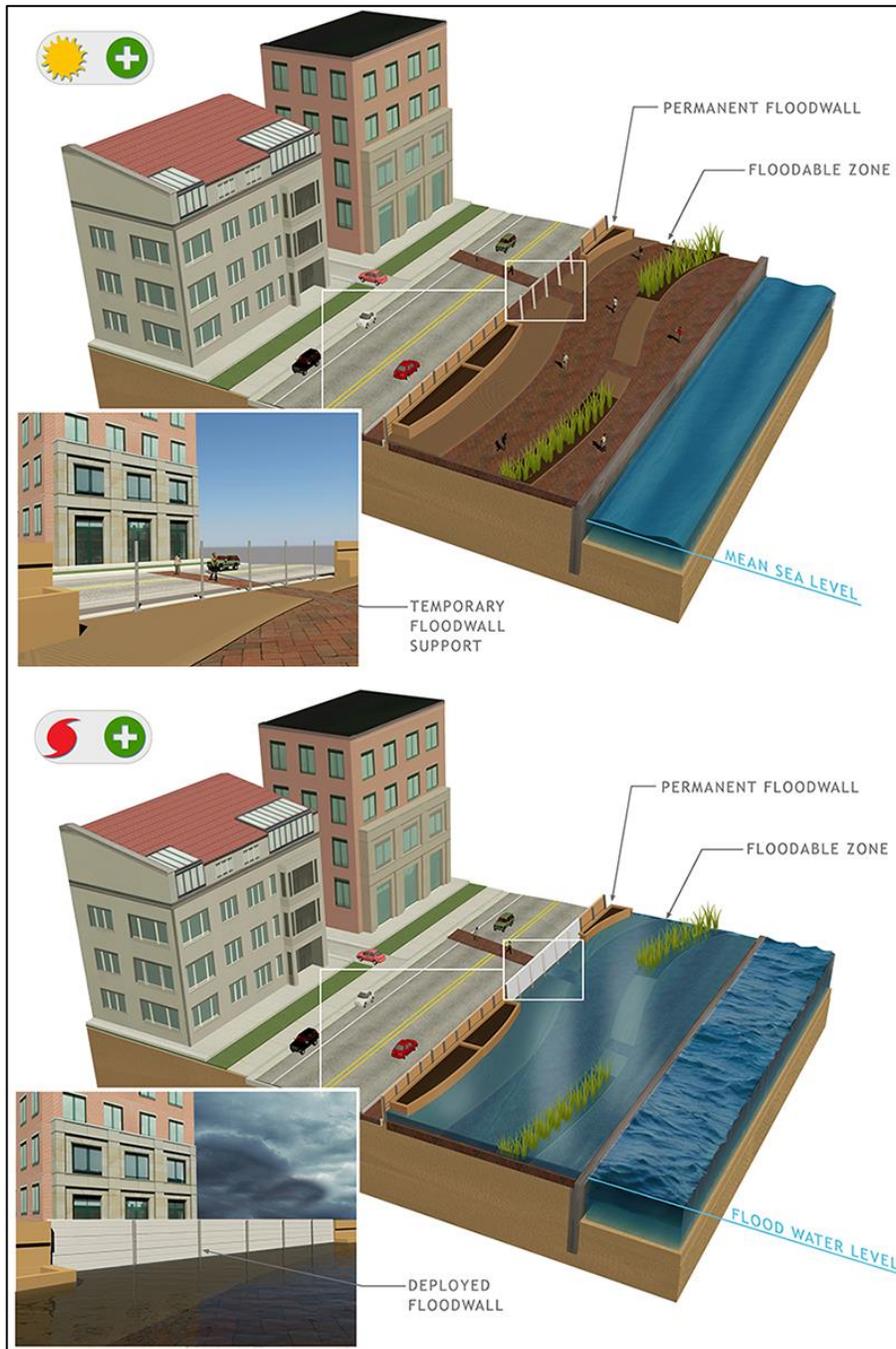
Example of a Typical Deployable Floodwall Layout (USACE 2015a)
